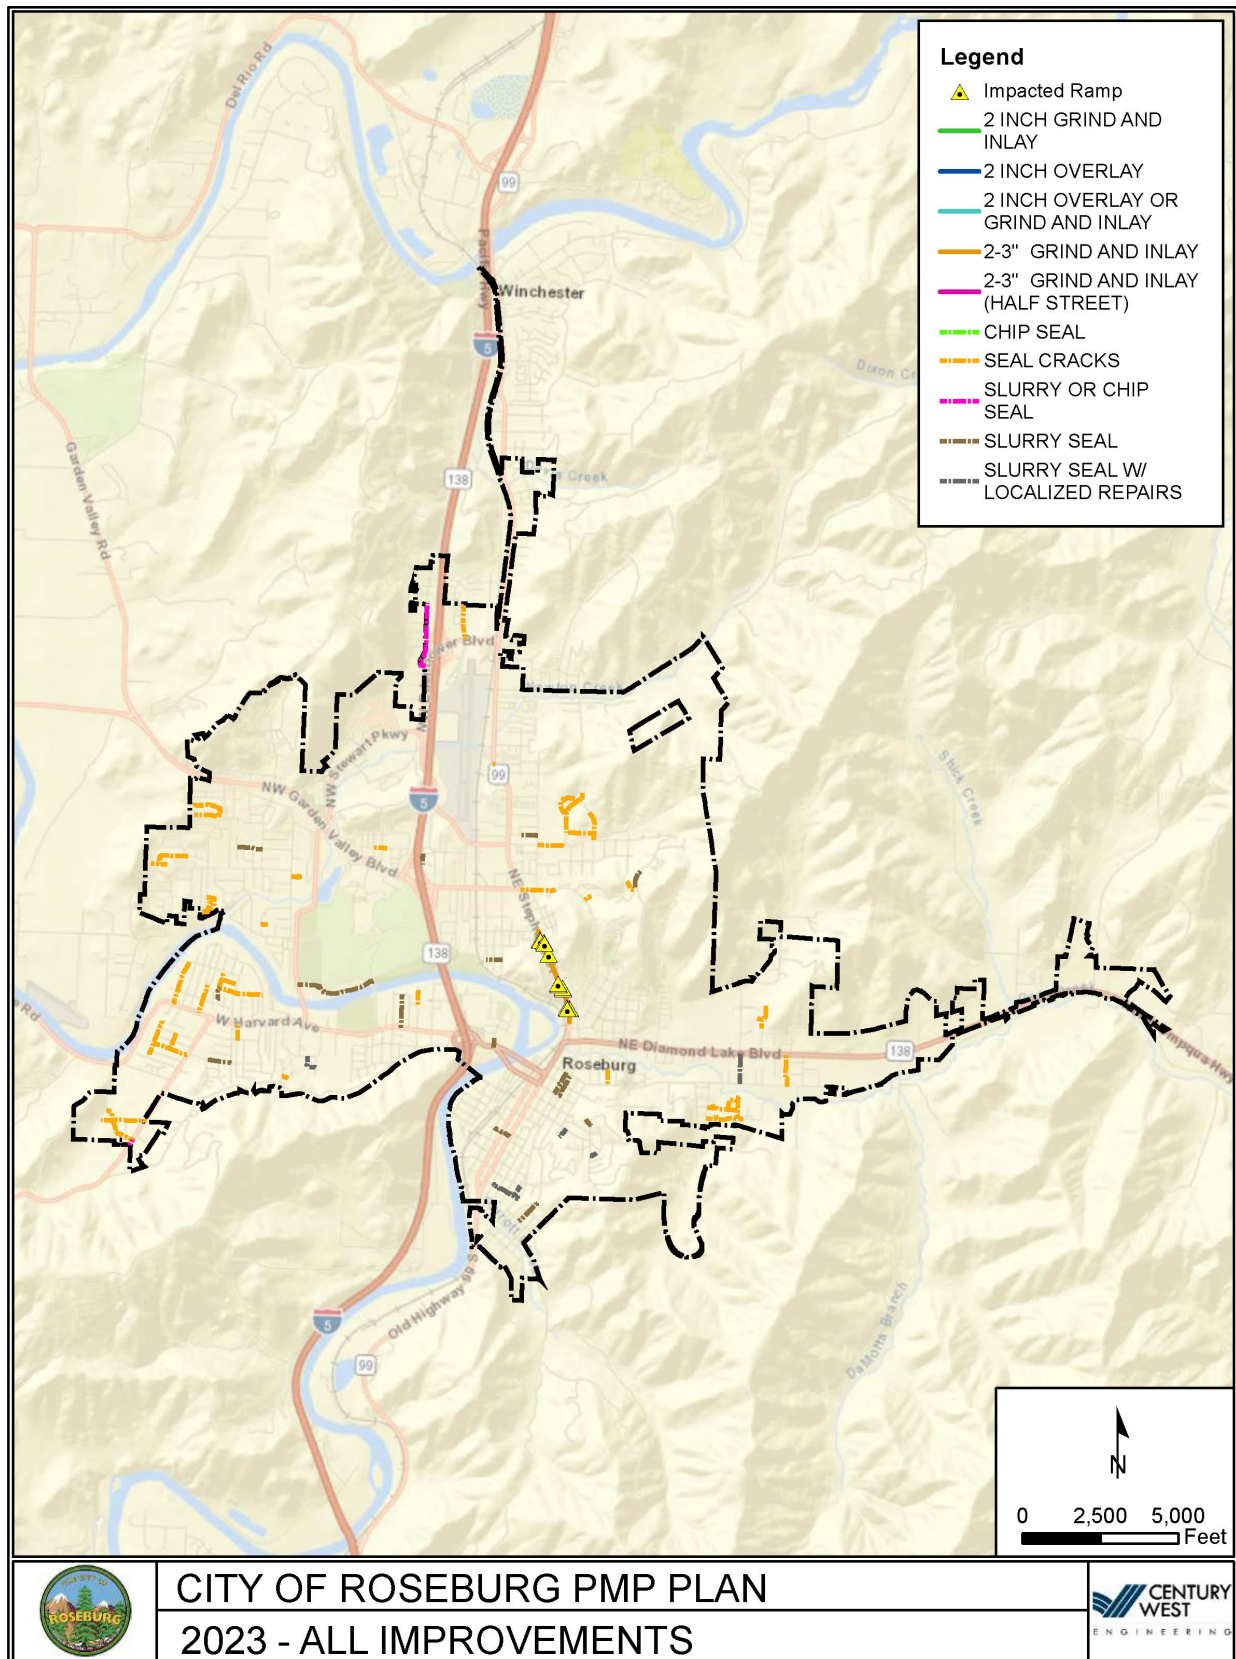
Five-Year Pavement Maintenance Plan: 2023
